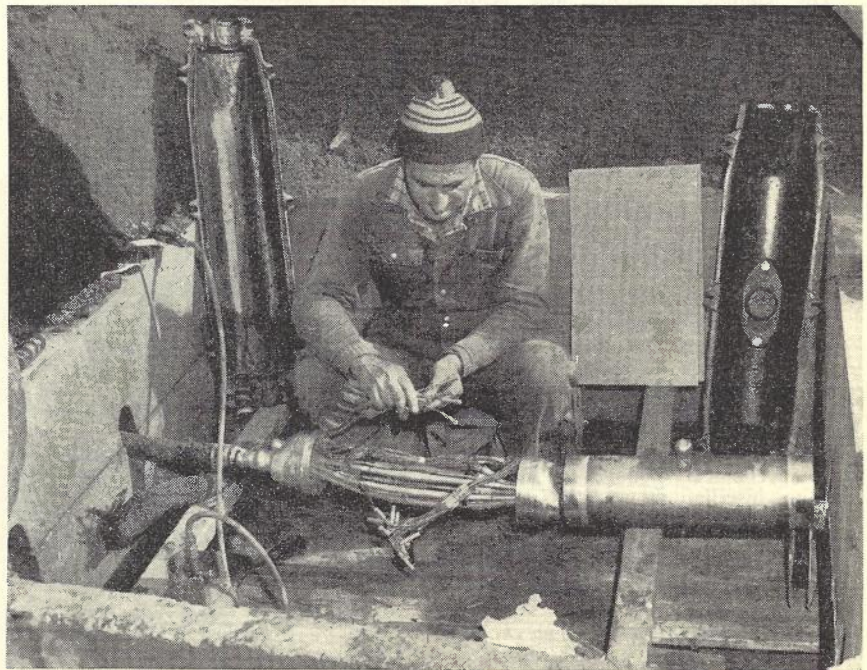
Cable Jointer Fitting Balancing Condensers in Joint. This Shows Copper Slip Sleeves, Prefabricated Sleeve Ends and Cast Iron Joint Protection Box.
